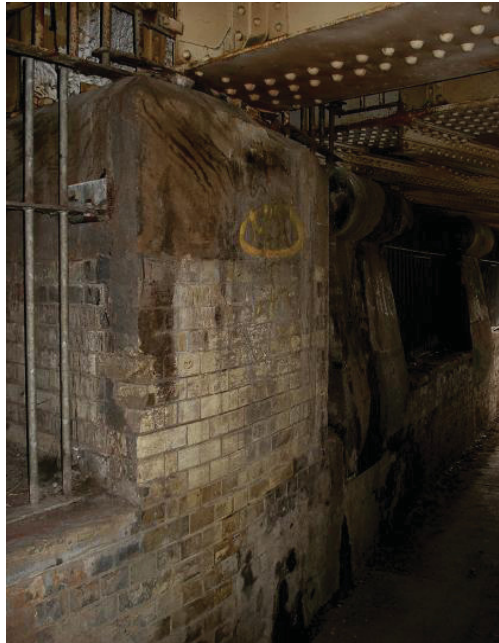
View of brick built abutment under the Greenway Bridge over the River Lea looking south-east
